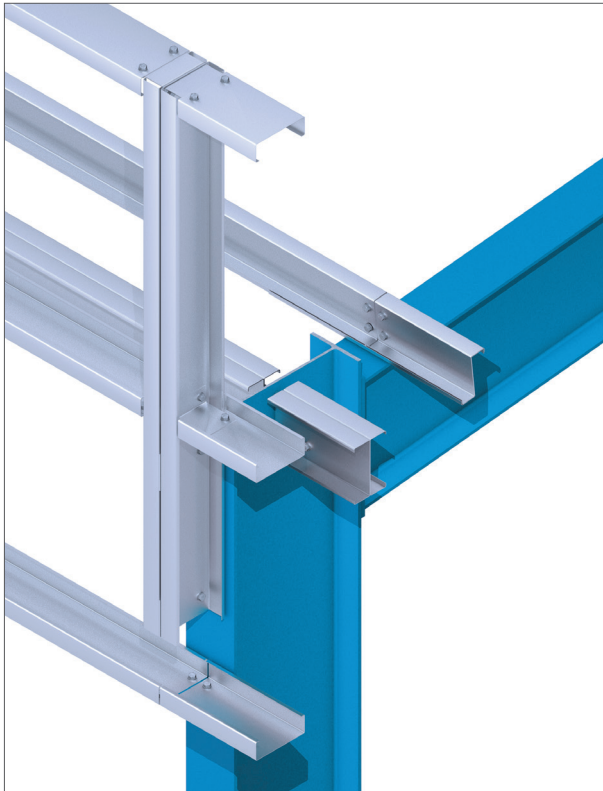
Detail of the eaves with a parapet and a spacer beam made of two C sections stabilising the frame corner
